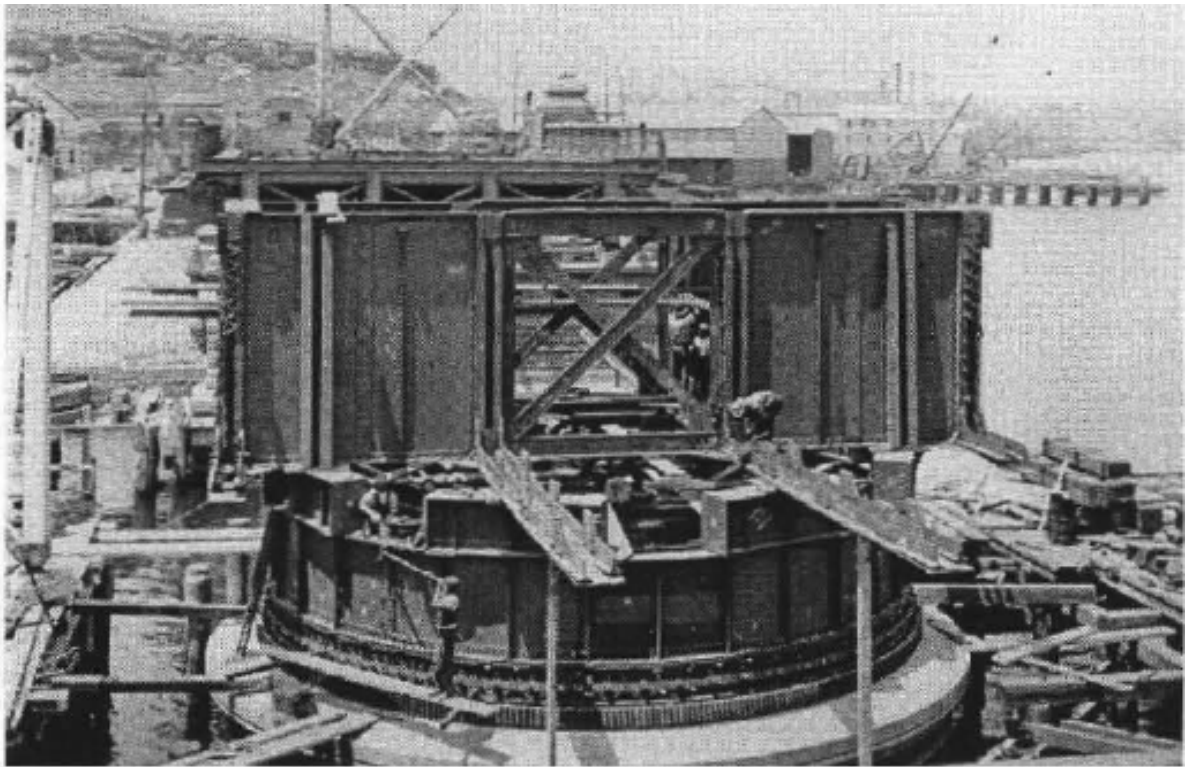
Rozelle side rest pier and approach span under construction in 1902 (Source: RMS photographic archives)
